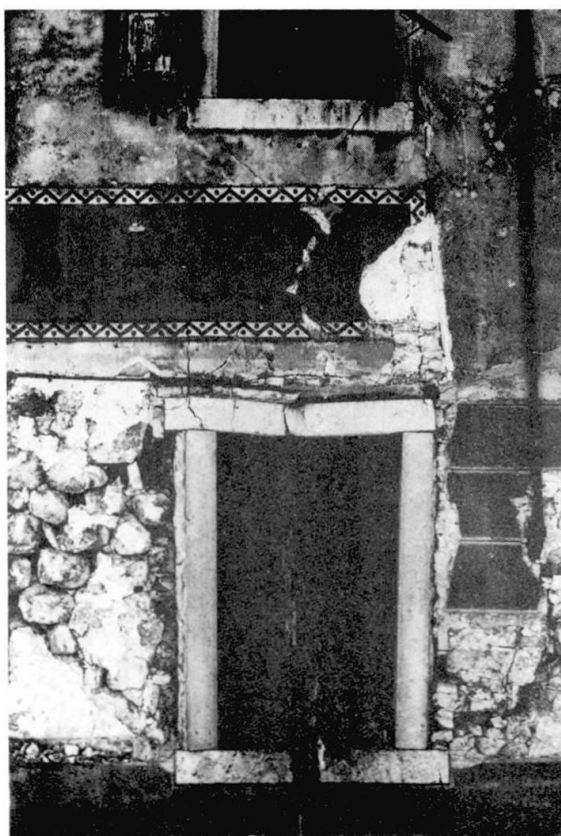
Collapse mechanism of masonry wall at Gemona.
